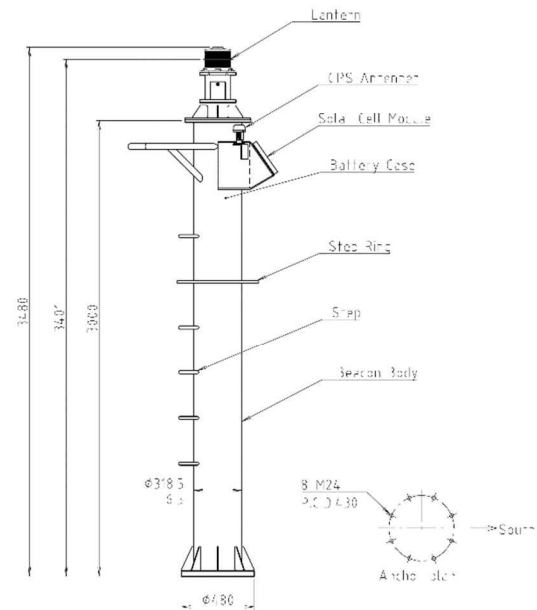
(11) Typical cross section drawing of beacon lights (newly installed)
